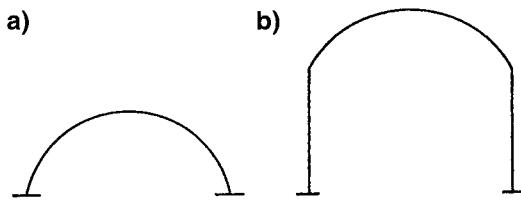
Arched girder types a) springing directly from abutments, b) standing on legs and forming the cross member of a portal frame
